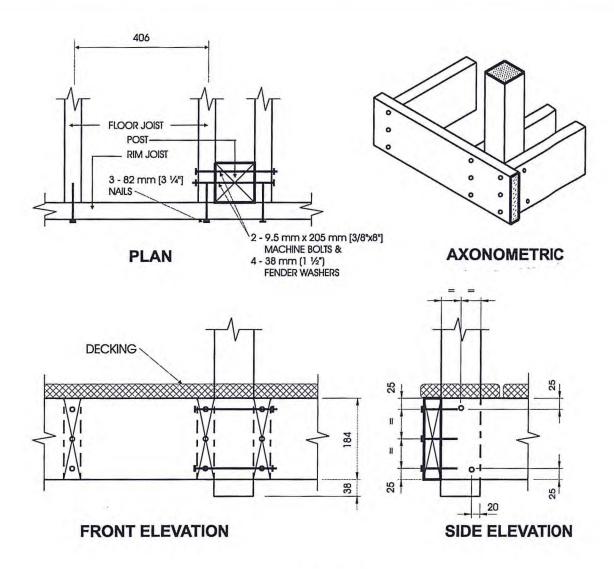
Exterior Connection: Post Bolted to Floor Joist - 9.5 mm (3/8") Bolts
